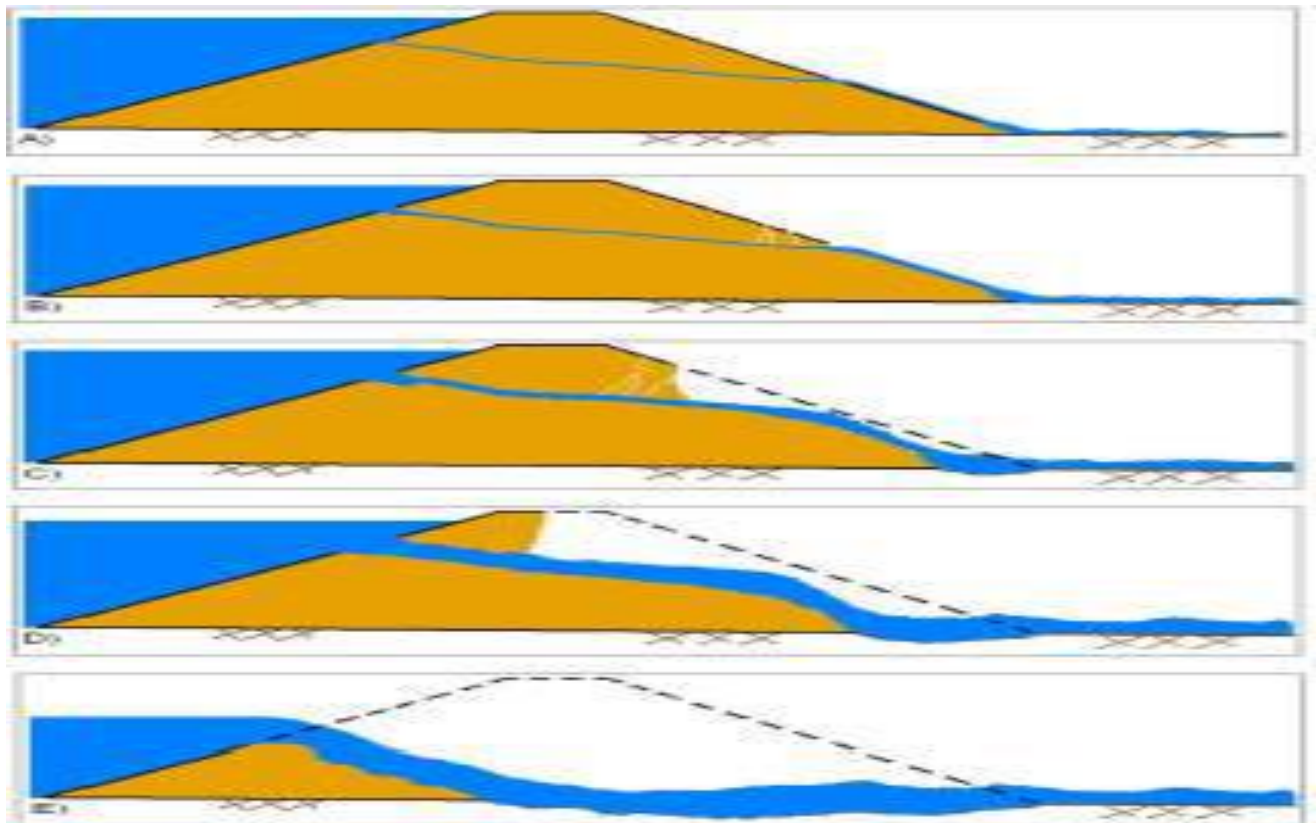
BREACH PROCESS FOR PIPING MODE OF FAILURE
